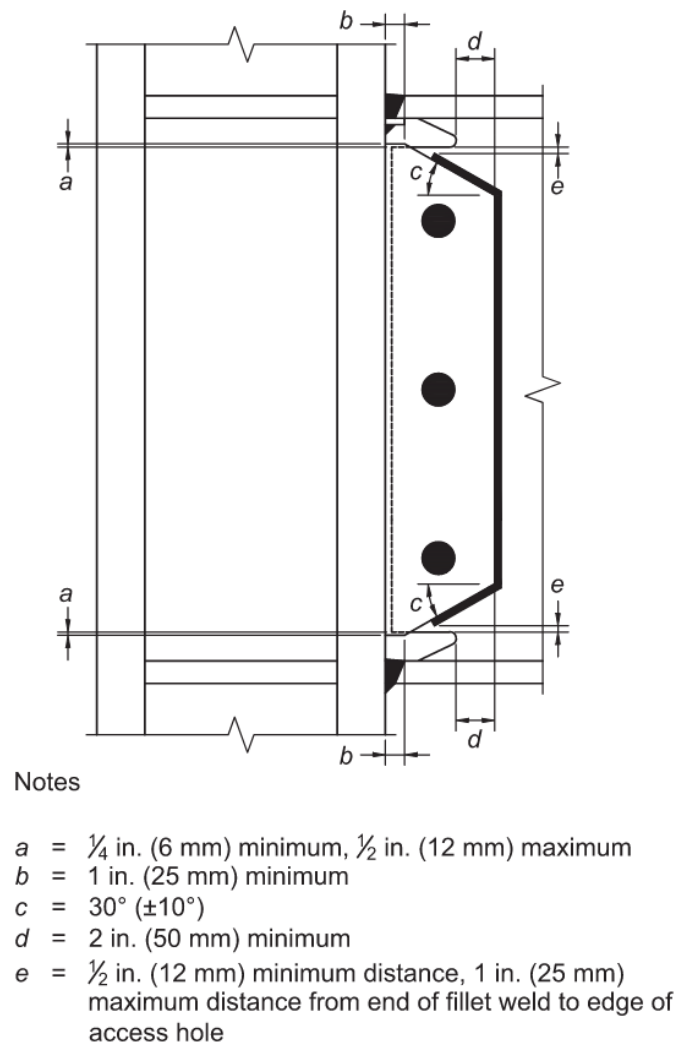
Welded Unreinforced Flange-Welded Web Connection Geometry
